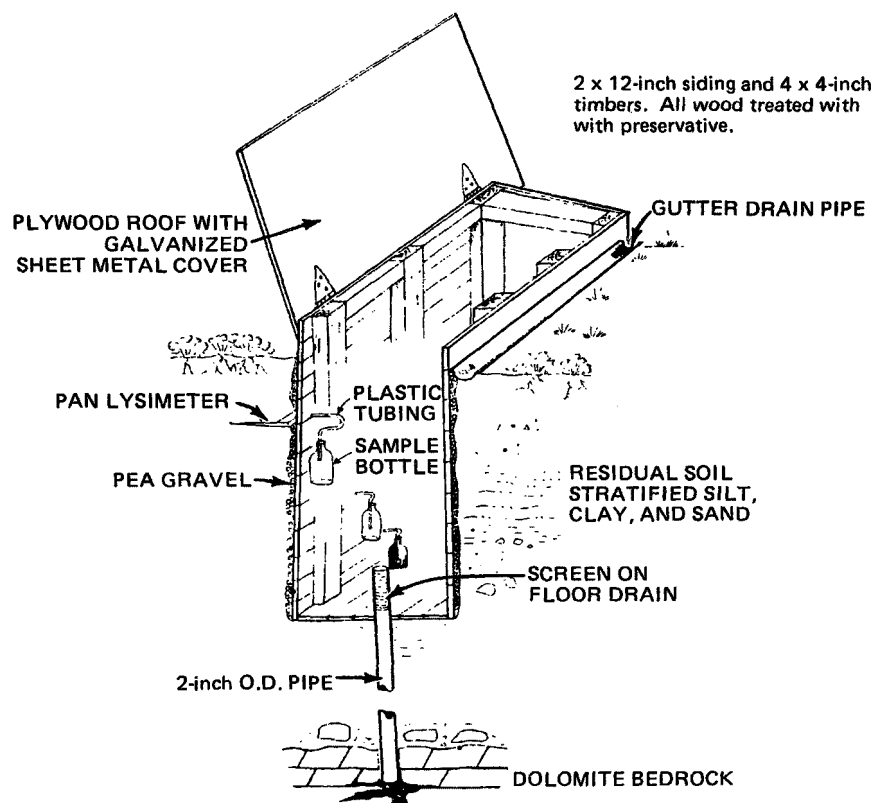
Trench lysimeters installed in trench shelter (Parizek and Lane, 1970)
